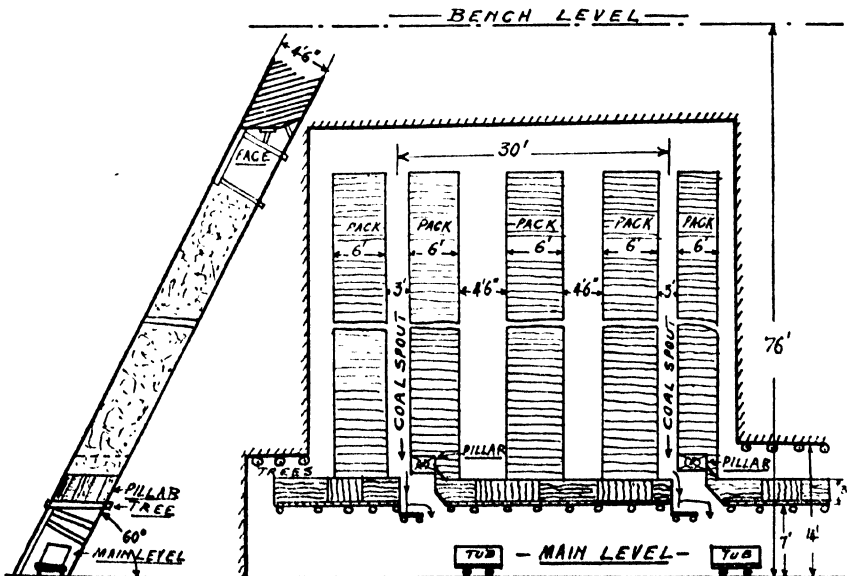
Section and Elevation of Steeply-inclined Workings.
